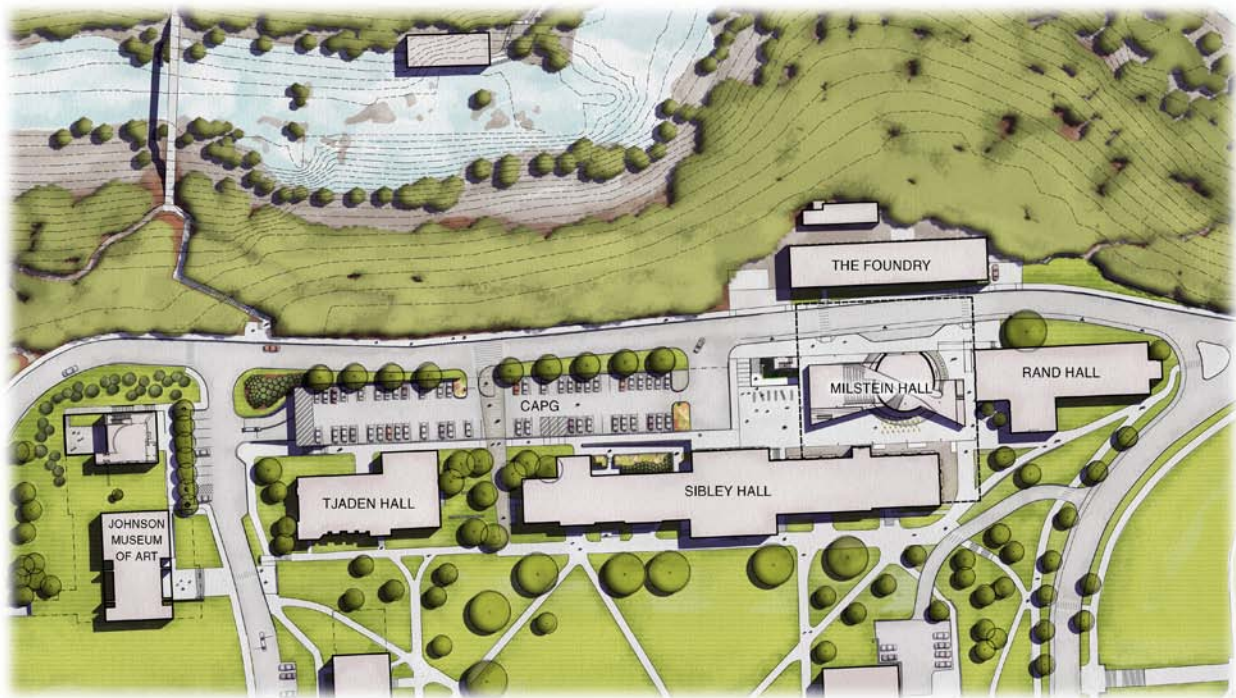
Illustrated site plan, Milstein Hall and the CAPG.
